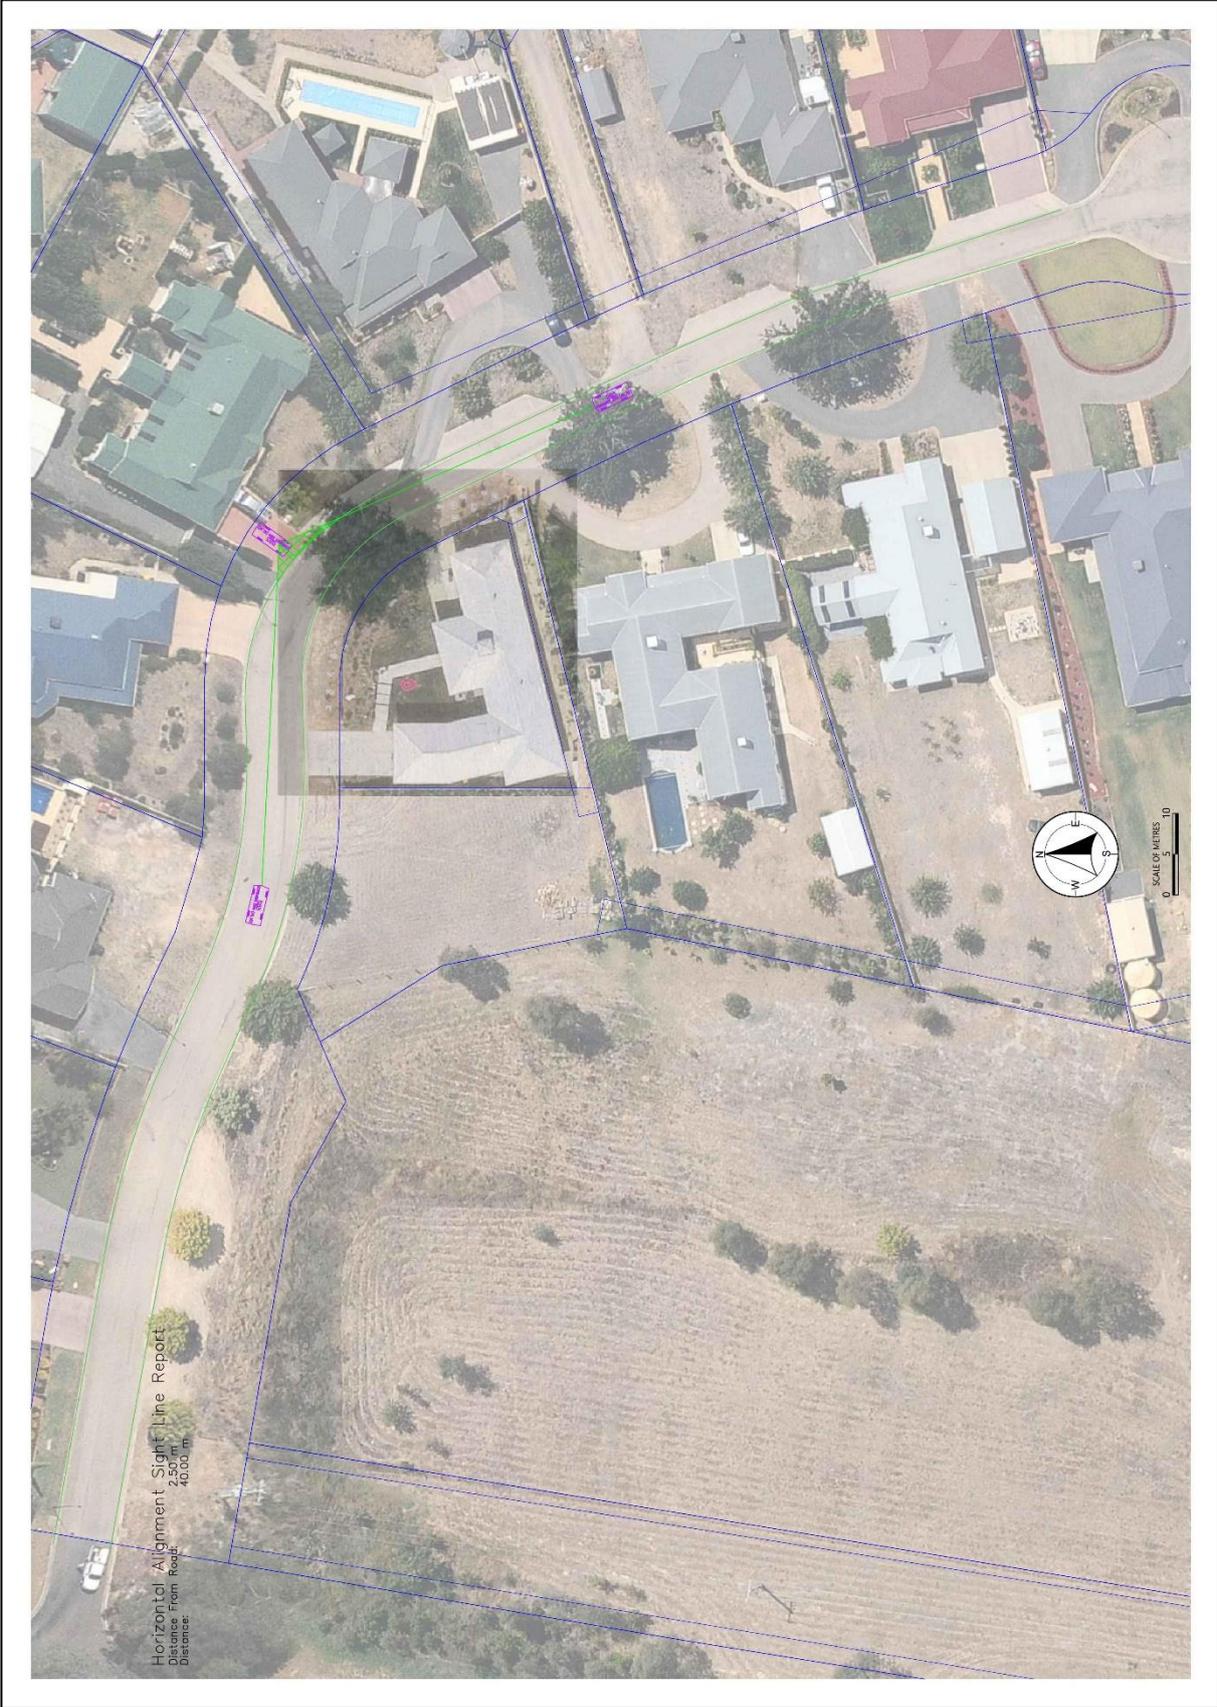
Stopping Sight Distance (SSD) – Driveway No. 10
